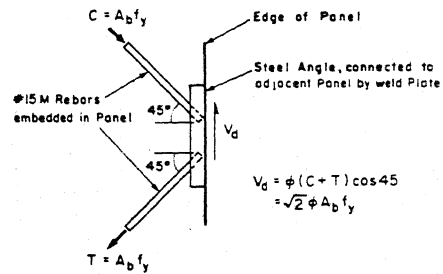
Embedded connection used to transfer Shear Force between Panels.
